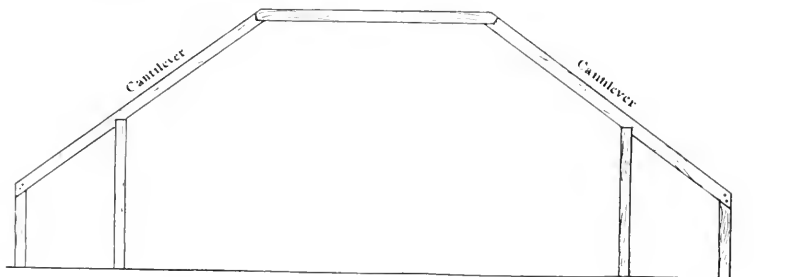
DIAGRAM SHOWING THE PRINCIPLE OF CANTILEVER ROOF-TRUSS.
